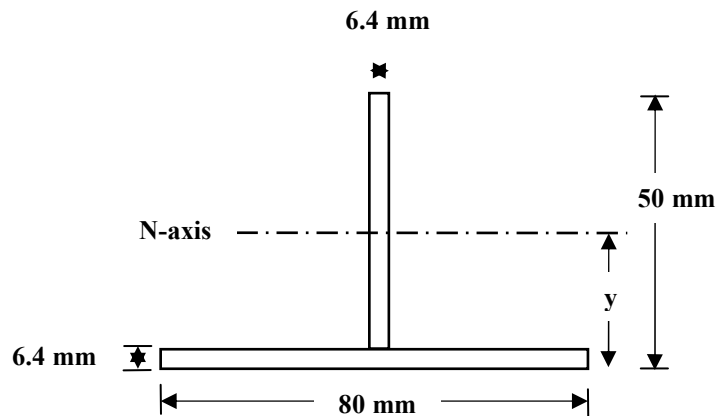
Cross-section of diagonal GFRP stiffener used in specimen B6
